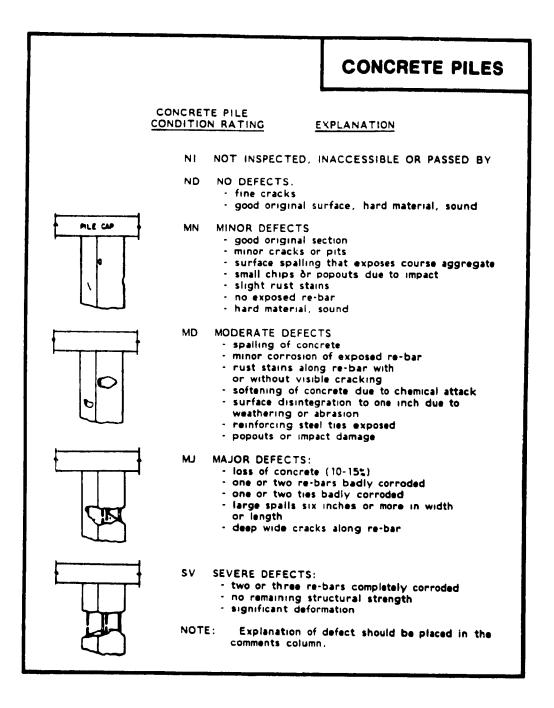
PILE CONDITION RATINGS FOR CONCRETE PILES<sup>5</sup>
